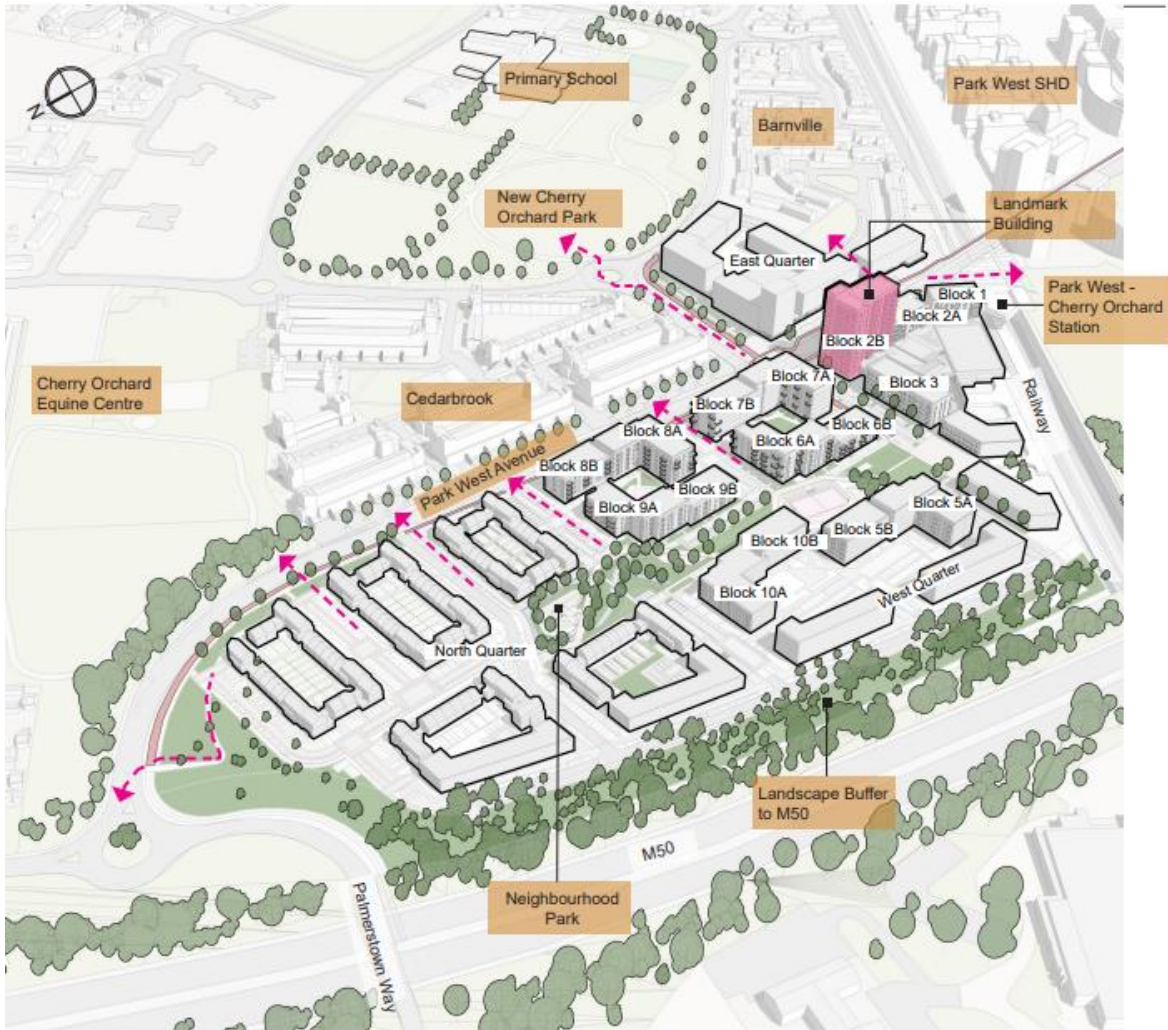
Aerial diagram of the development plan for the site (courtesy CCK Architects)
